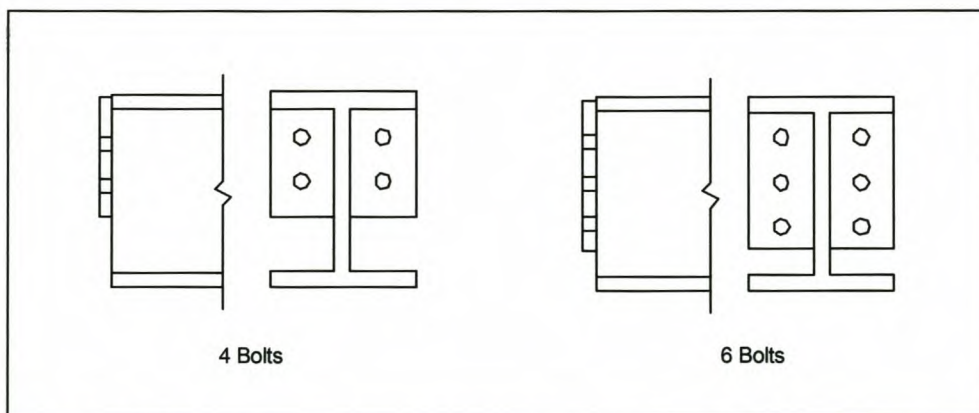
Design alternatives for welded end plate connections
